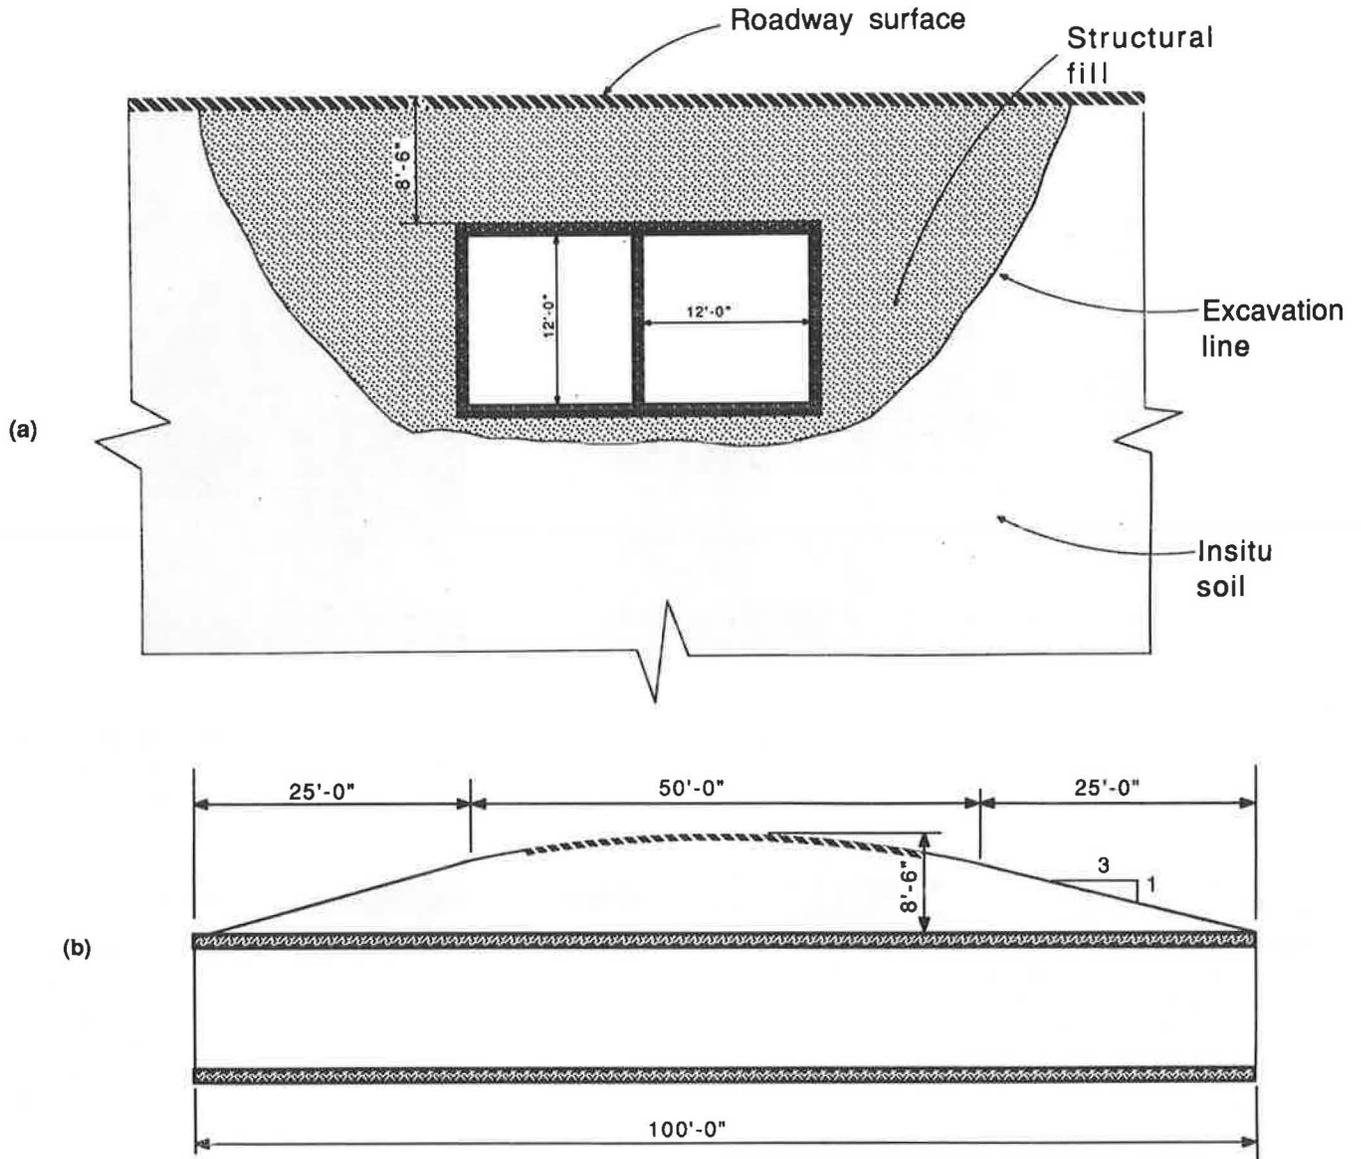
Twin-box culvert, (a) Section A-A, (b) Section B-B.
